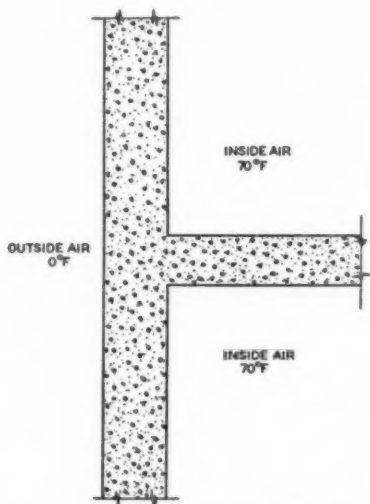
CONCRETE WALL AND FLOOR SLAB SECTION
